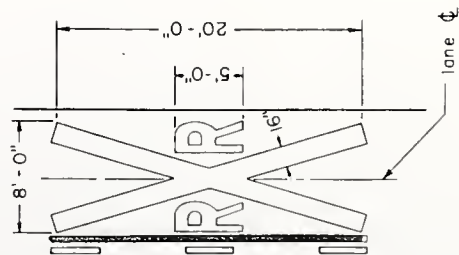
ROADWAY PAVEMENT MARKINGS STANDARD (SOURCE:
